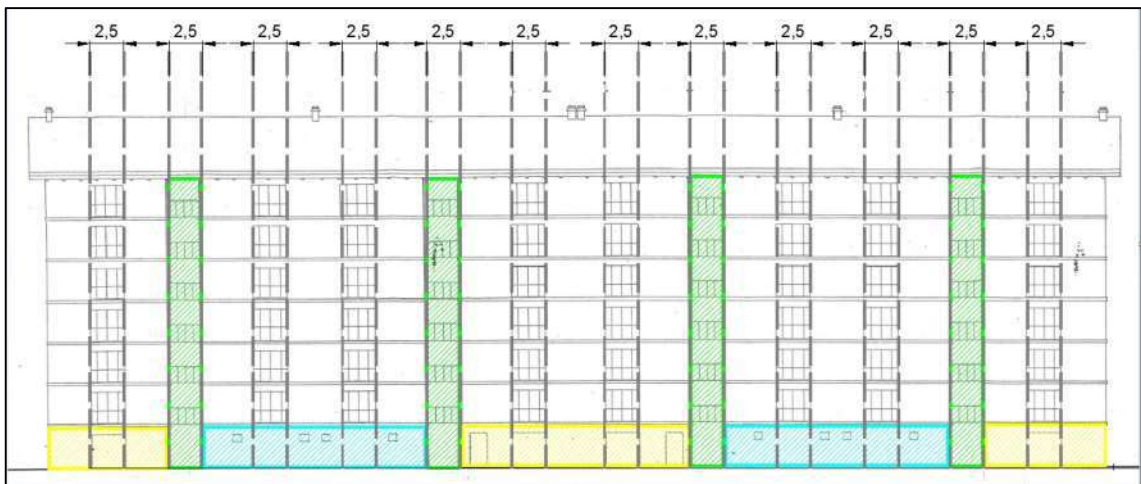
North Elevation: The porches are highlighted in yellow, the stairwells in green and the cellars in light blue.
